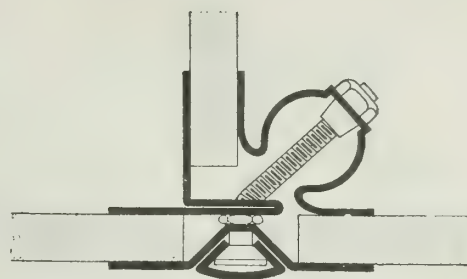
DETAIL SECTIONS OF KAWNEER STORE FRONTS
